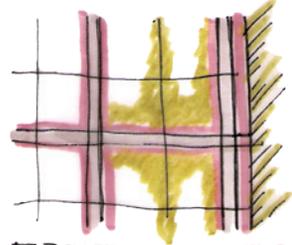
Various plan forms of how the building can step to utilise the most northern light
